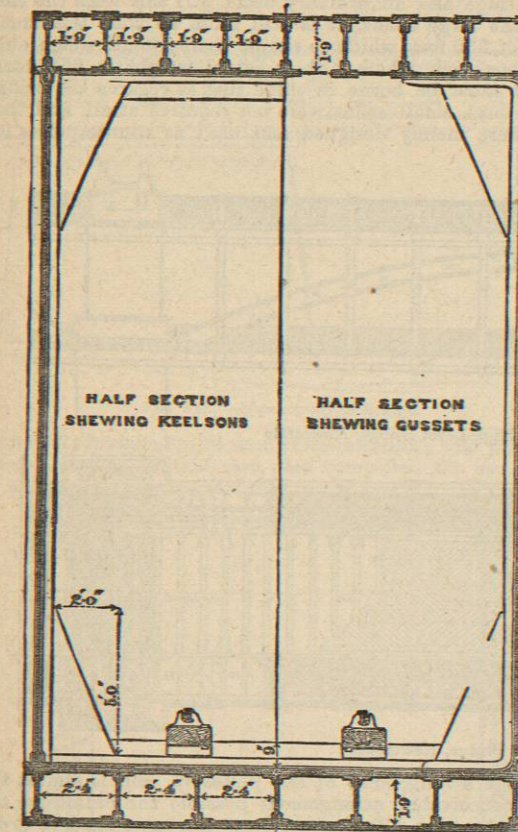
Britannia Bridge (Cross Section of Tubular Girder).
